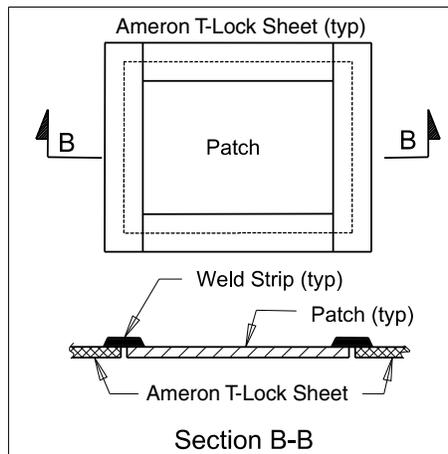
Large repairs are made by butt- or lap-welding a repair piece to the surrounding Ameron T-Lock sheet. Shown here is a typical butt joint. When making repairs using a lap-weld joint, provide a minimum of 1-inch overlap following normal lap welding procedures.
